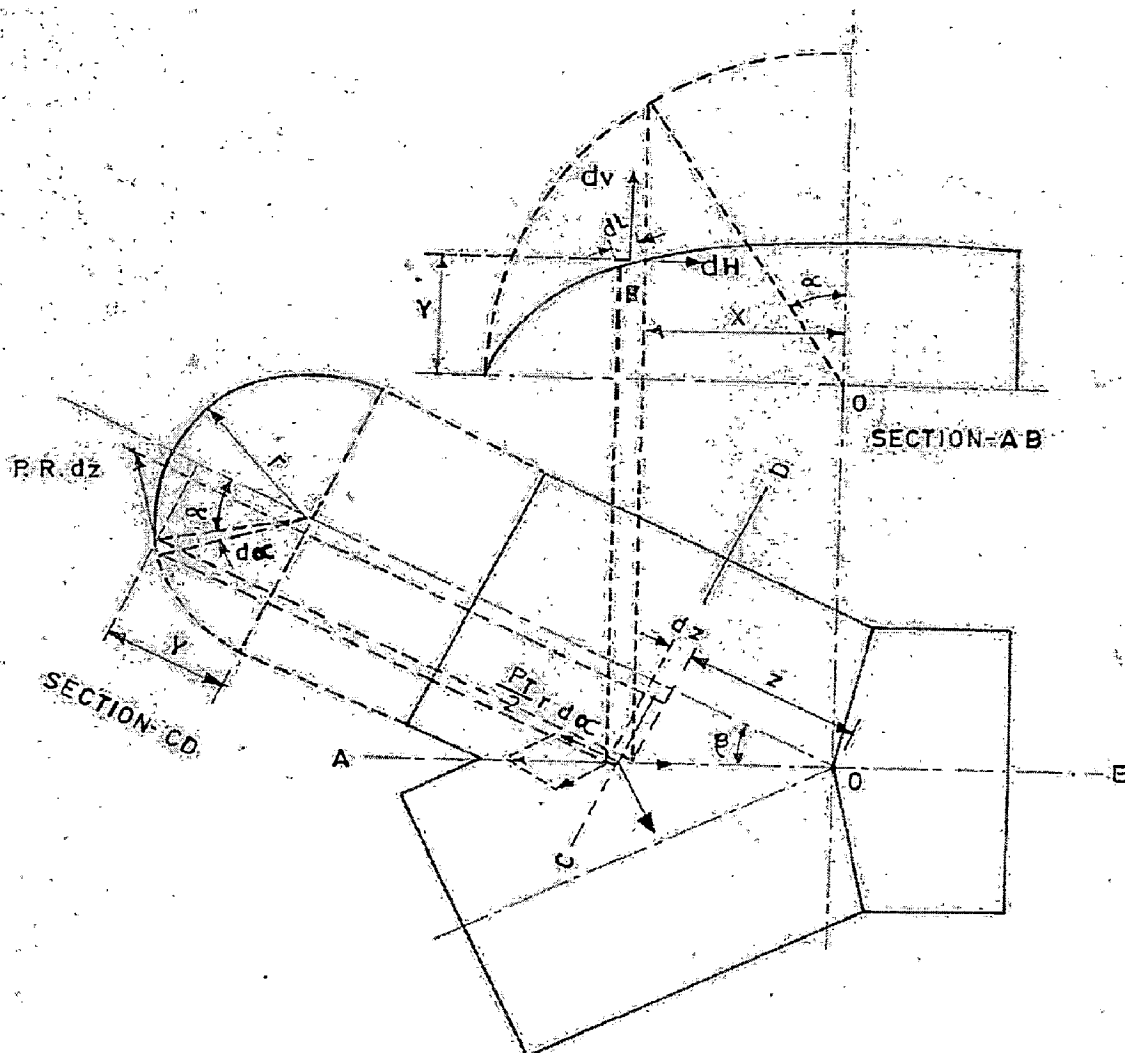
Plan of a Cylindrical Symmetrical Pipe Branch (To Assist the Calculation of the Forces Transmitted From Pipe Wall to the Strengthening Ribs)
